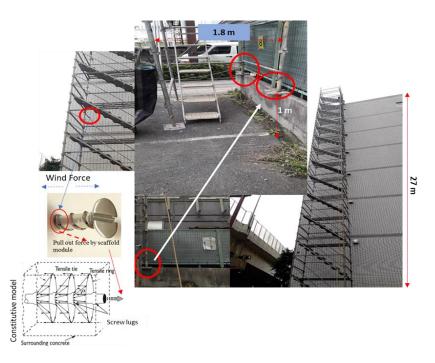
Renovation of the roof of 27 meters high building in Tokyo.
